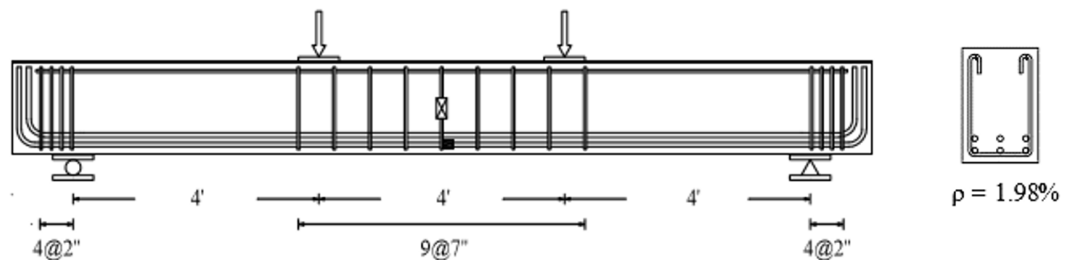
Load pattern, rebar detail, cross section and location of instrumentation
